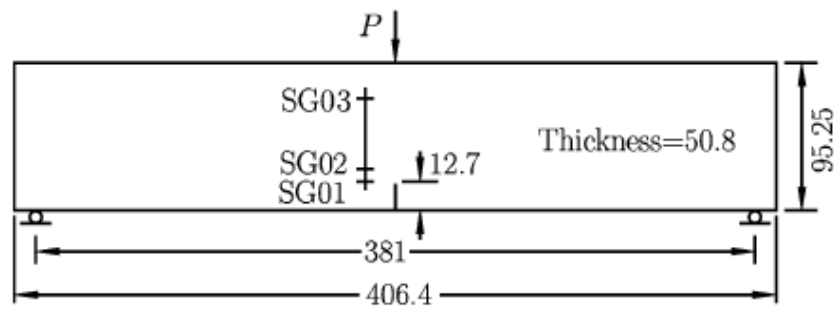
Impact test of a concrete beam (unit: mm) (Su et al. 2010)
